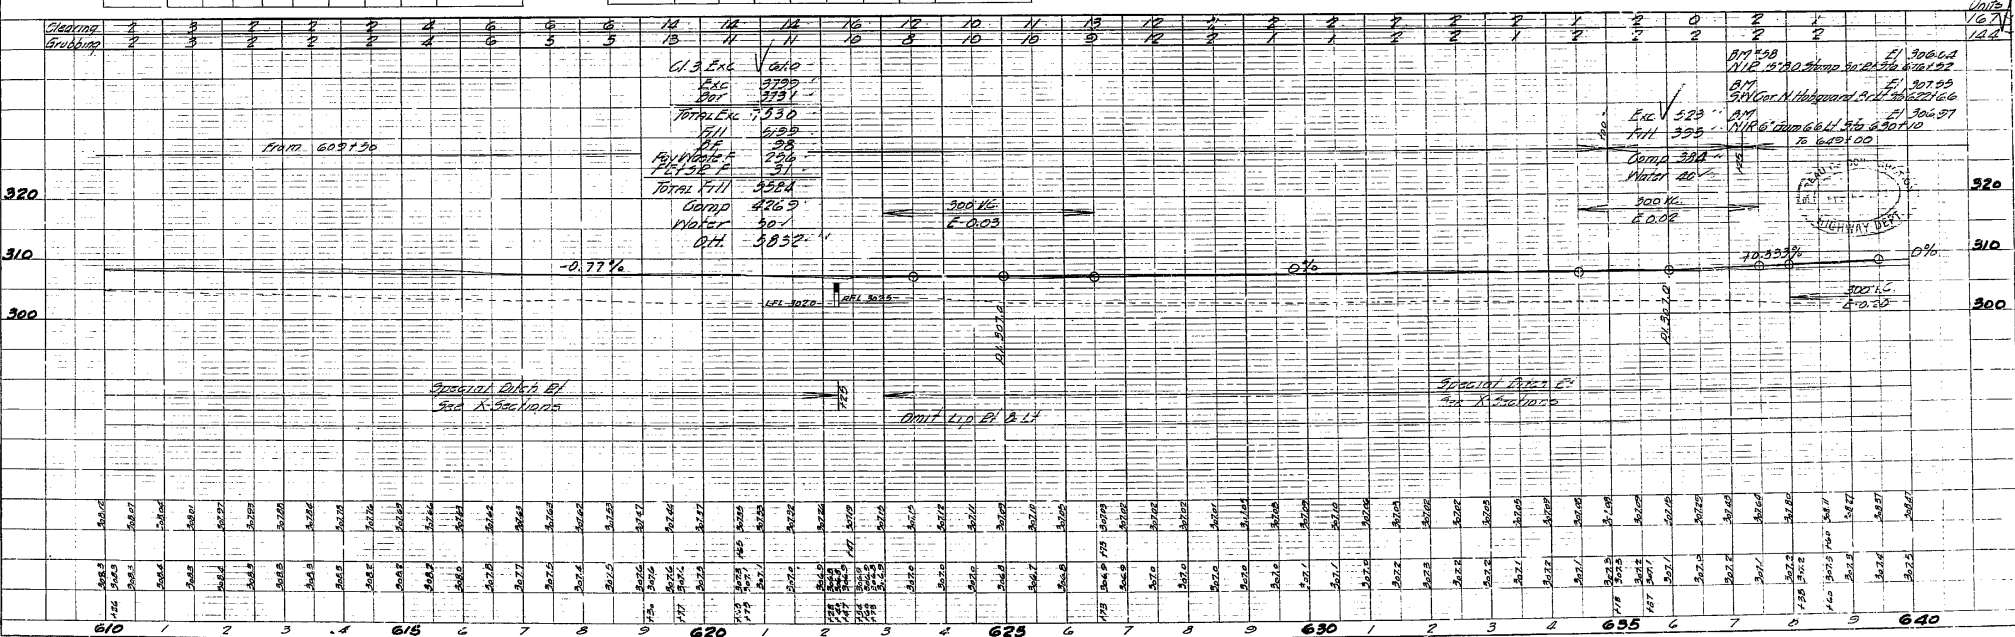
PLAN - PROFILE OF DRAINAGE STRUCTURE
